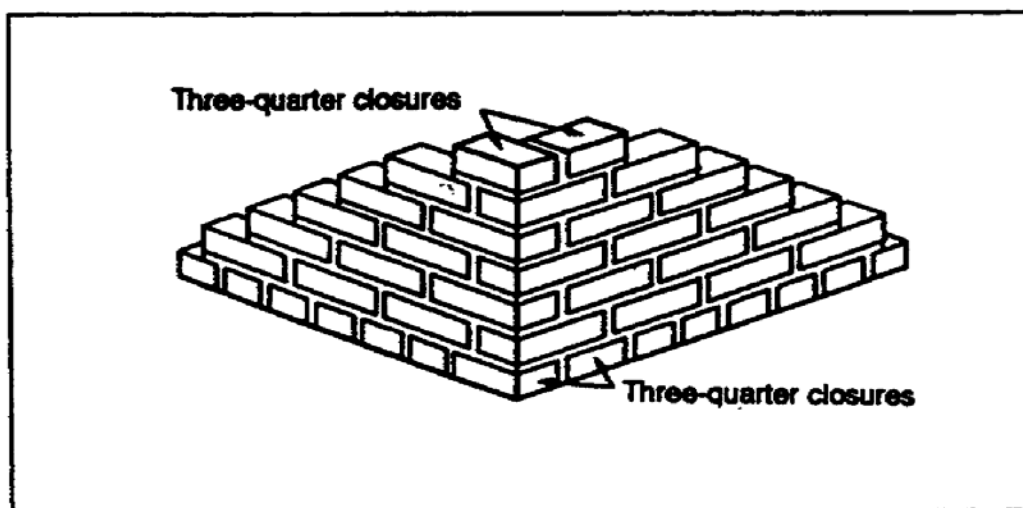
Corner lead for an 8-inch common bond brick wall
